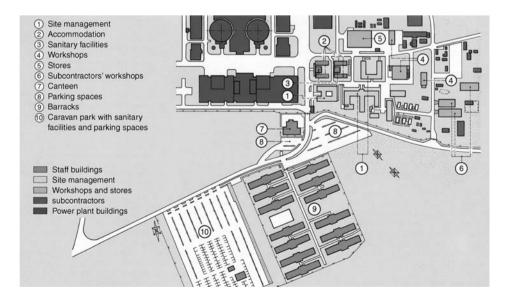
Section of site installations plan KRB II Gundremmingen [17]
